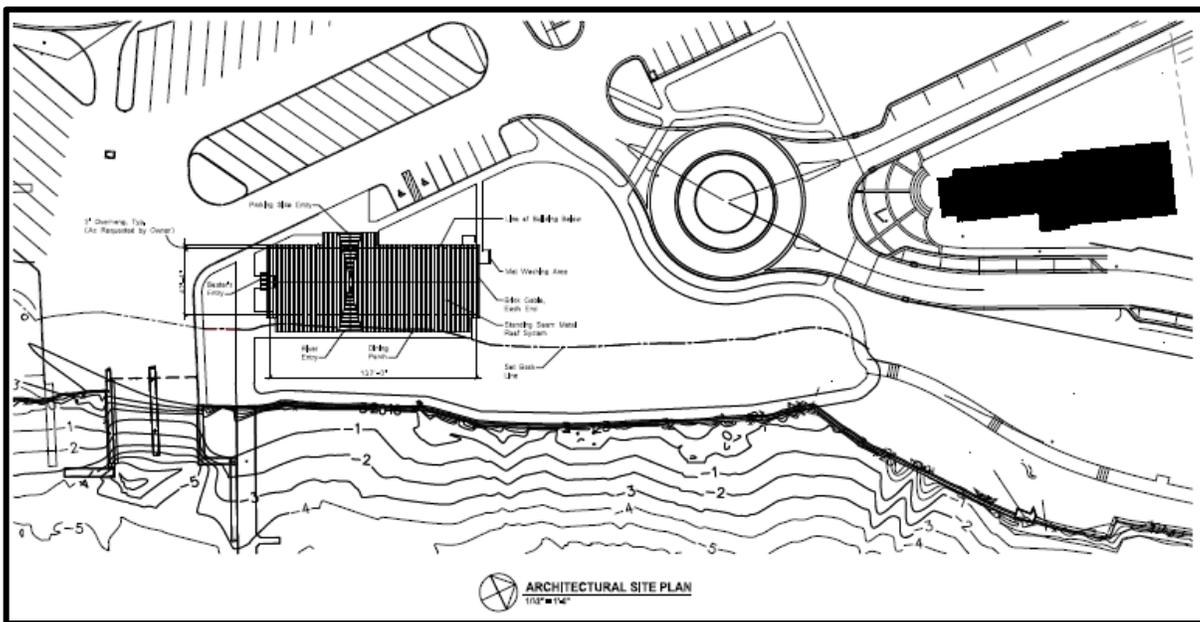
Site Plan. Ship's store shown in middle left, church shown to right.
